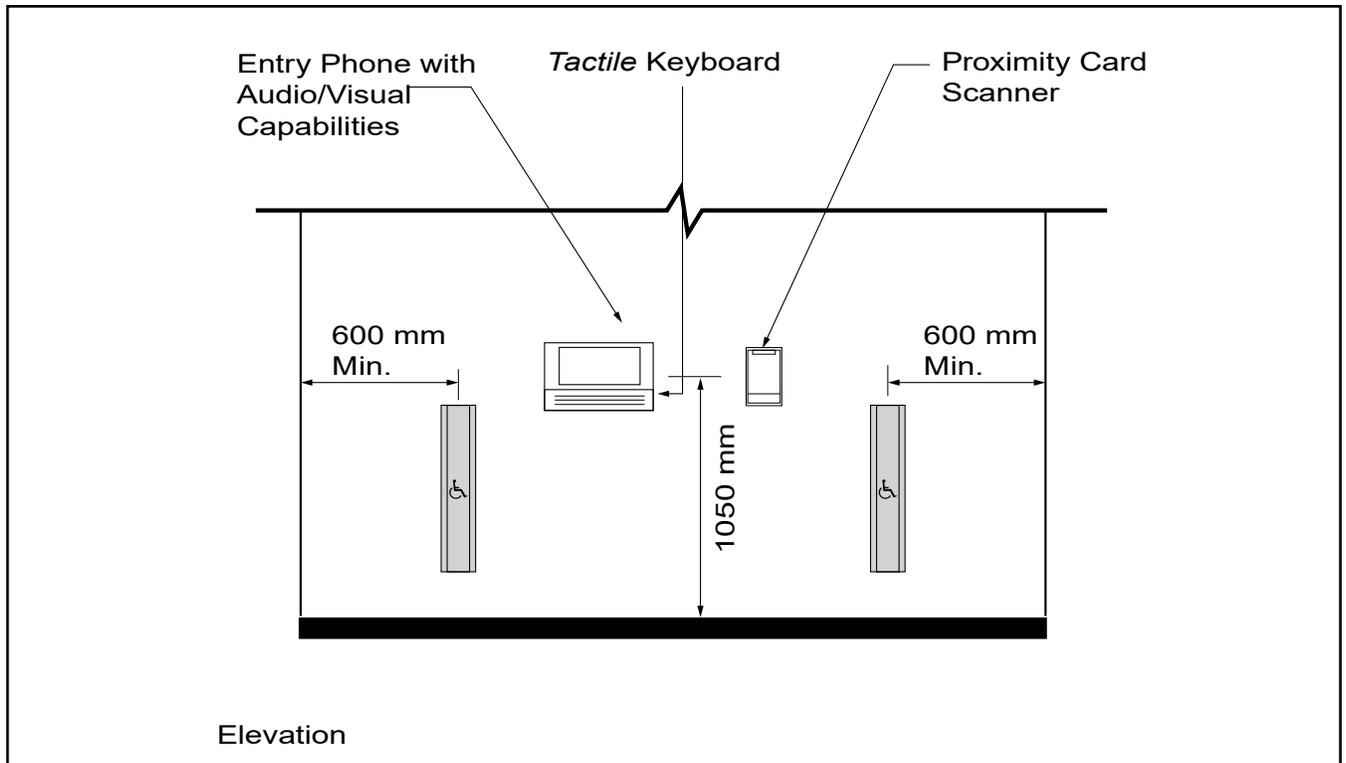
B Card Access and Building Security Systems - Elevation View
